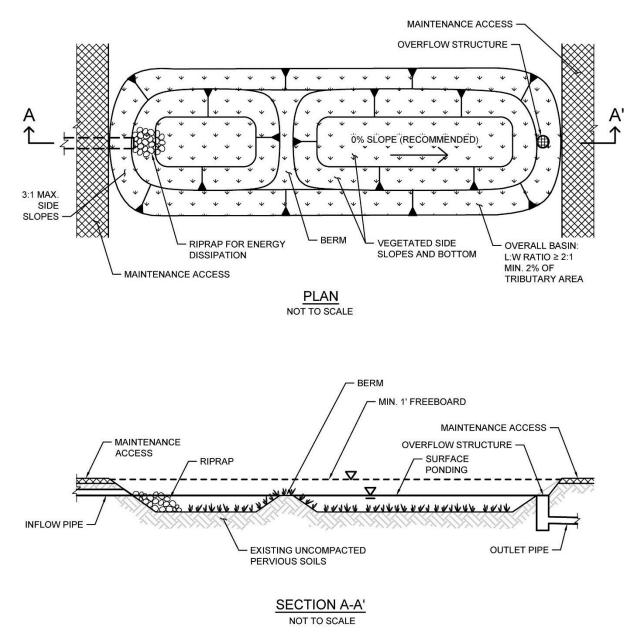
E.9-1: Typical plan and section view of an Infiltration BMP
